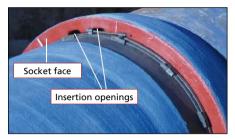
Fixing in place of the locking segments by a clamping clip
